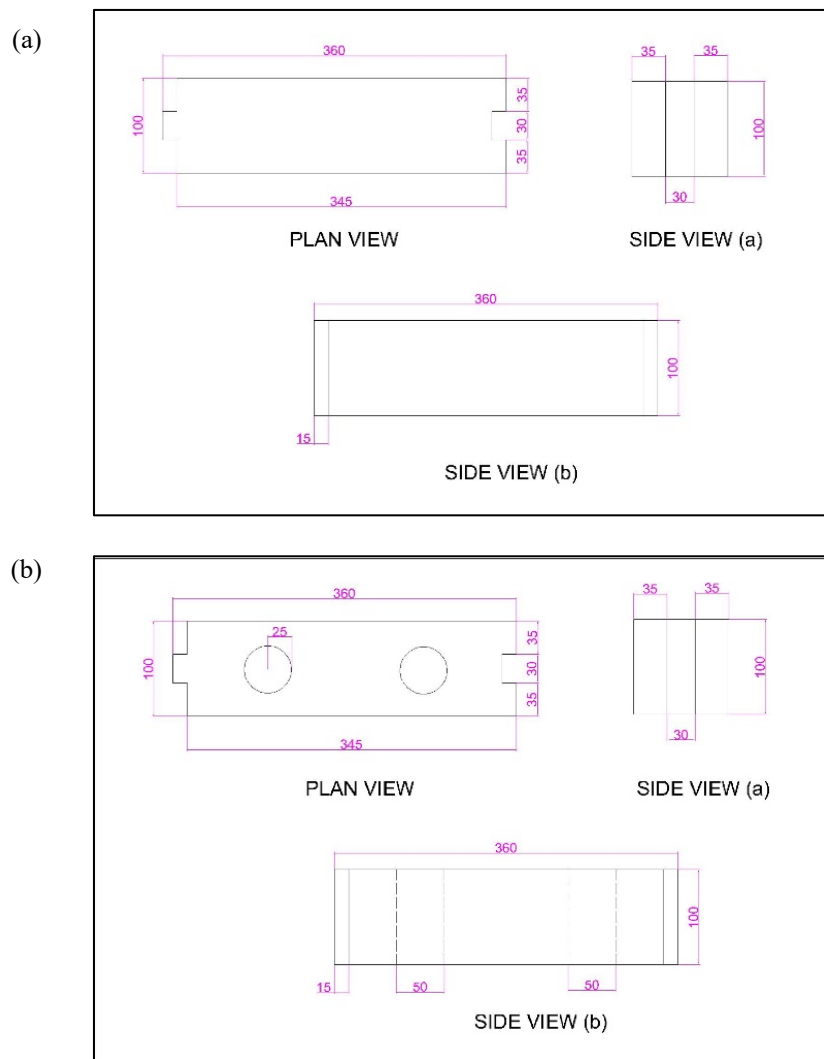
The schematic diagram of: (a) SICB (b) THICB (unit in mm)
